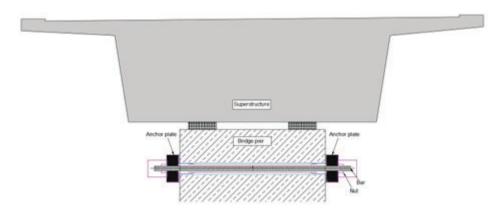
Example of internal shear strengthening of a bridge pier with pt bars.
